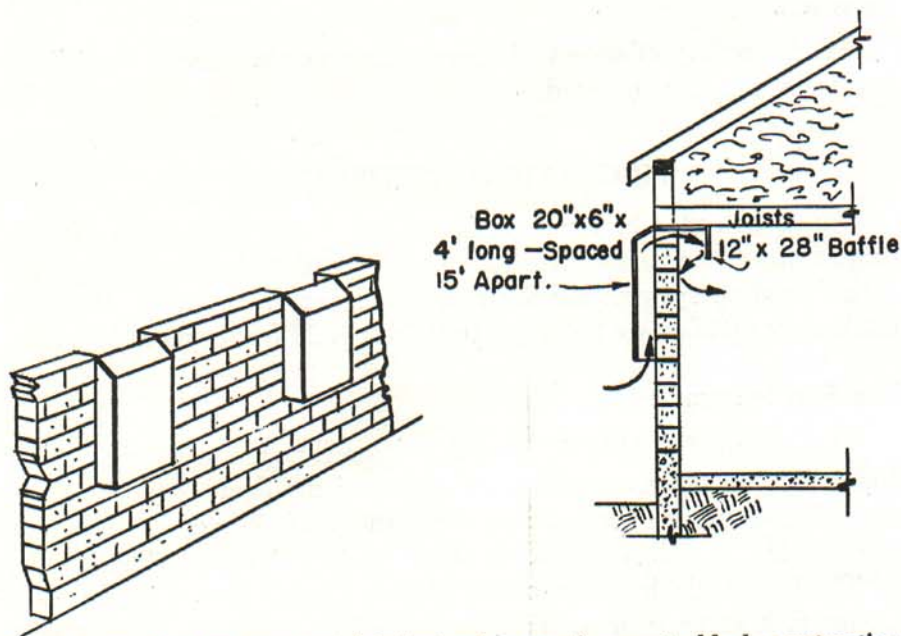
Intakes for straw loft laying houses of concrete block construction. The wall is pierced at the top course only, for 20-inch openings spaced 15 feet apart; wooden flues present a neat exterior appearance.
